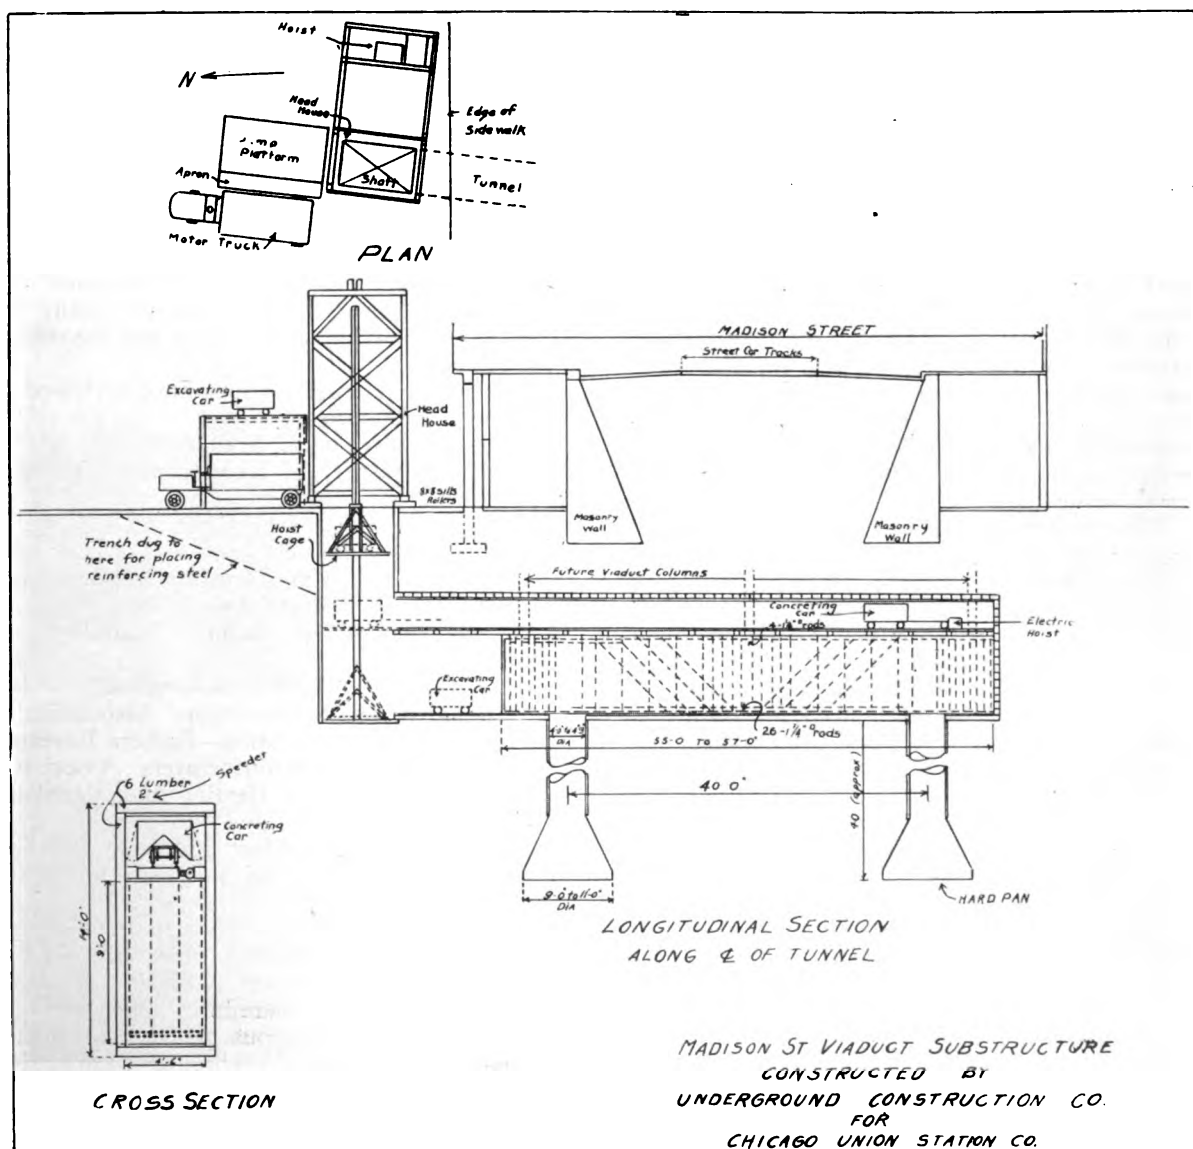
Sketch Showing Method of Constructing Viaduct Substructure.
